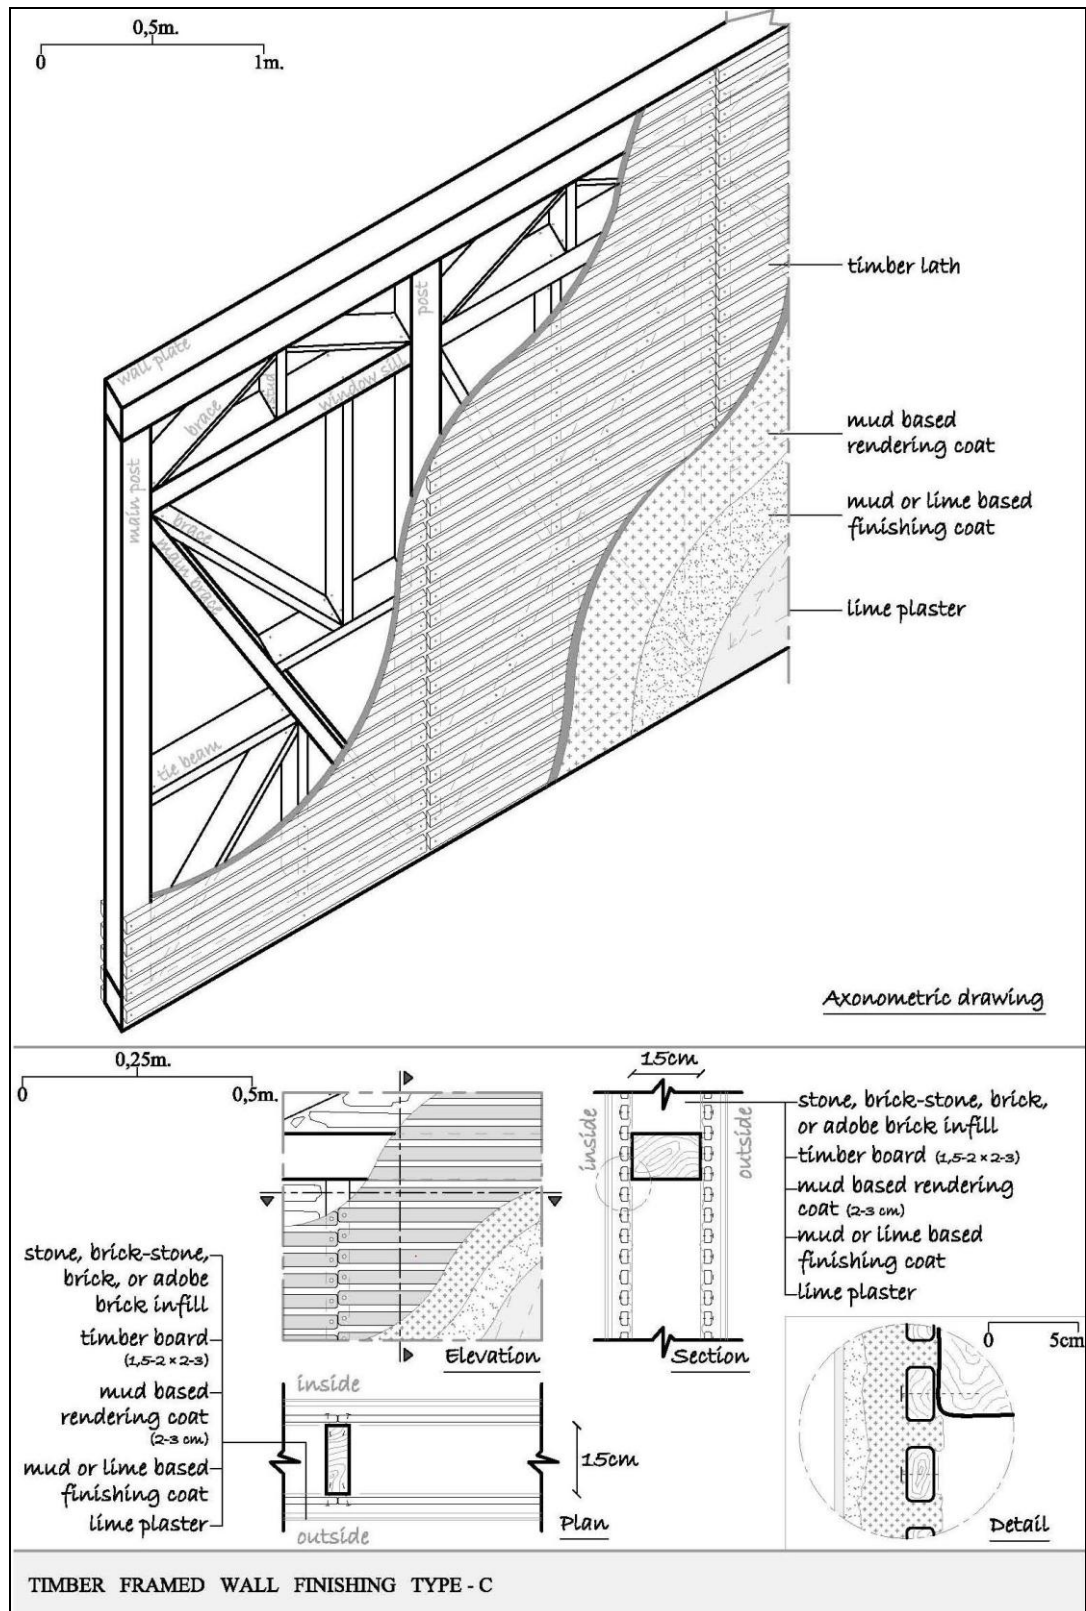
, Schematic drawings of timber framed wall finishing Type C - Timber lath below the render
